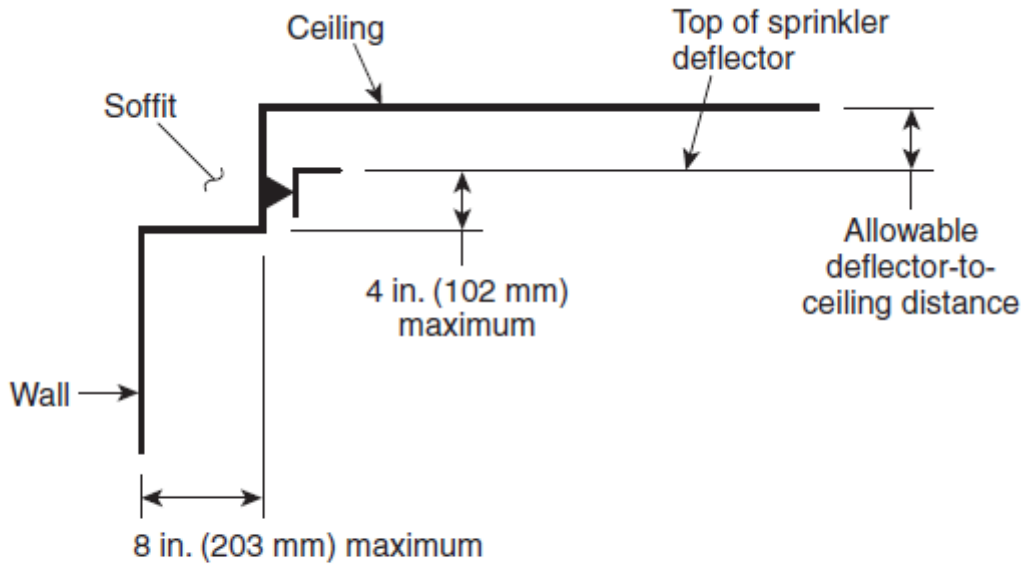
Location Sidewalls with Respect to Soffits — Sidewall in Soffit.
